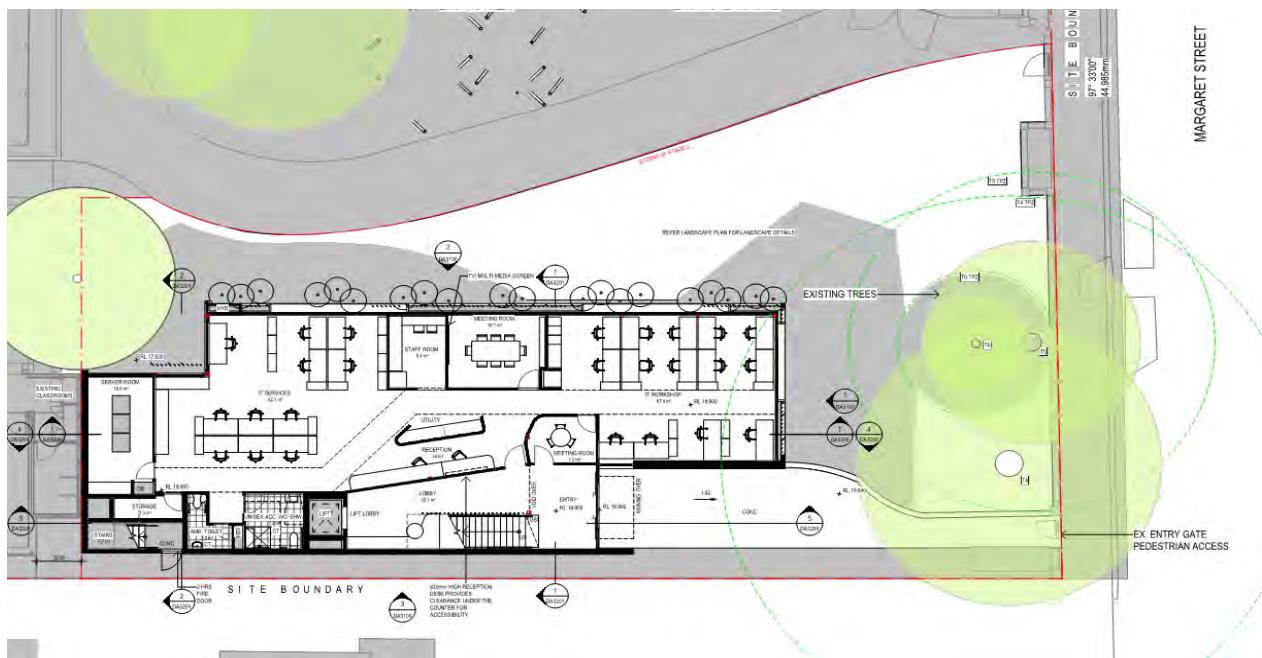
Extent of Proposed Site Works (Source: Ground Floor Plan prepared by Allen Jack and Cottier)
